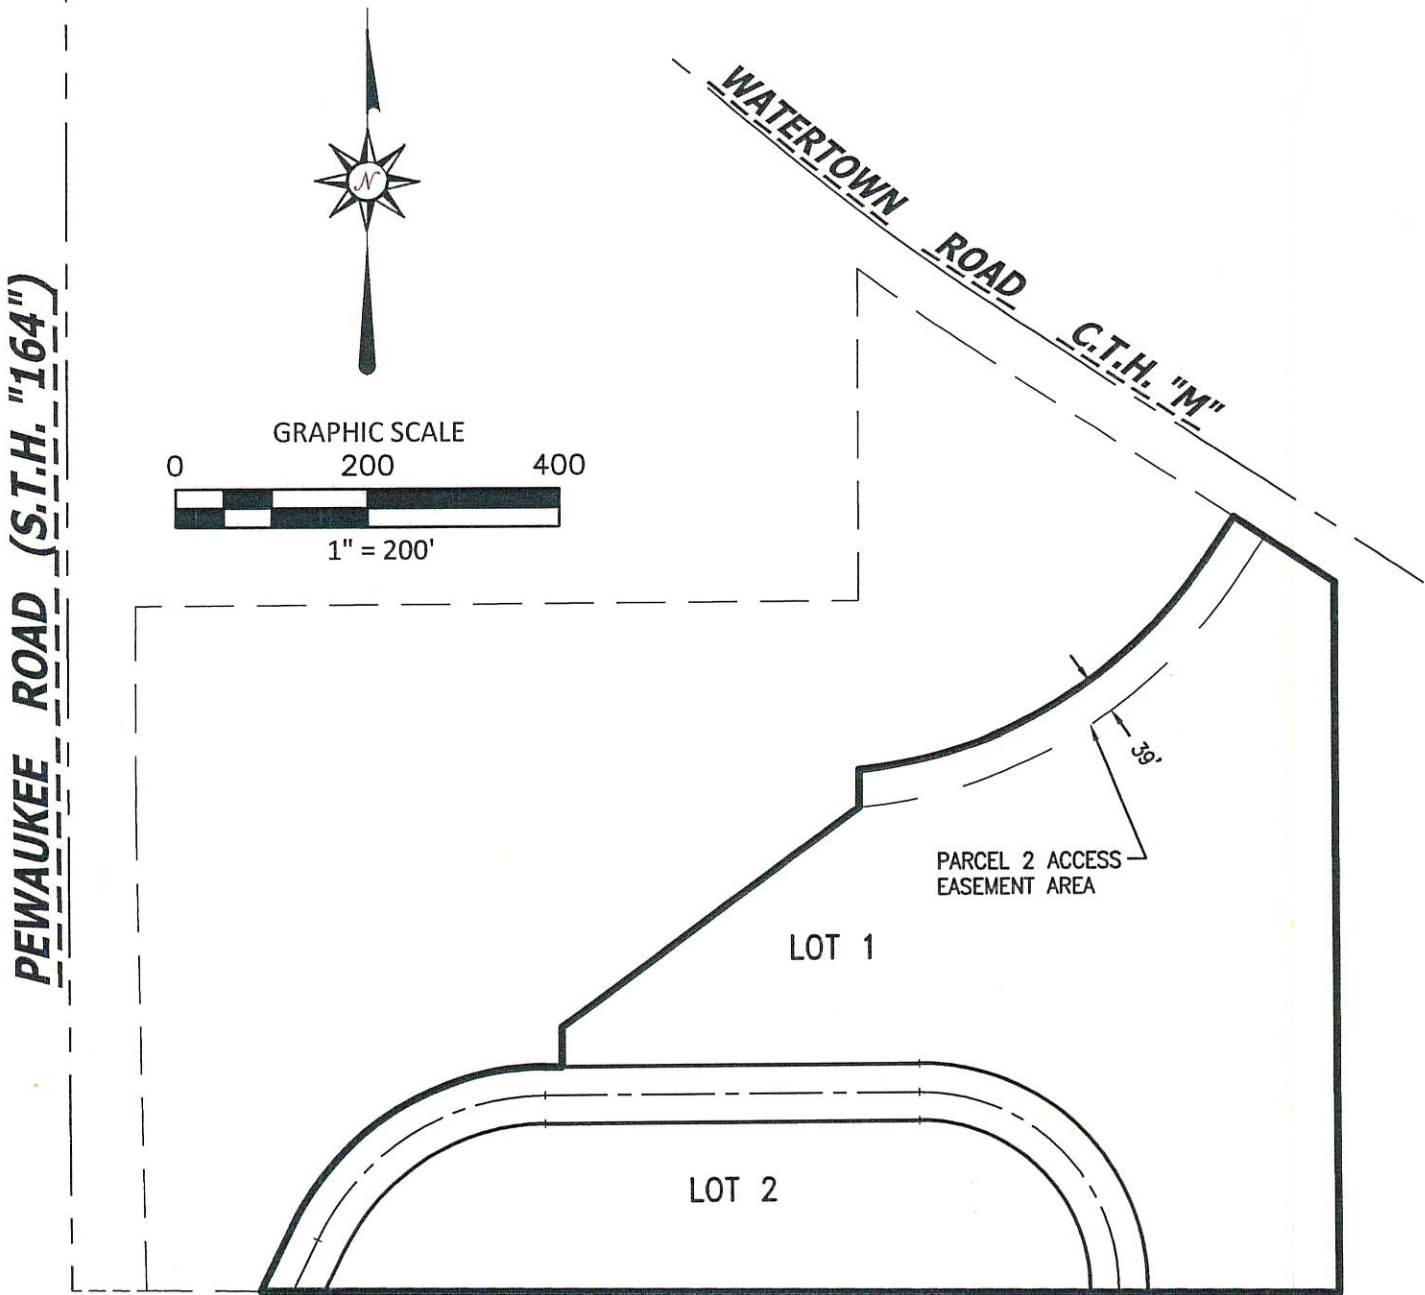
grb Sheet 3 of 10 Sheets
